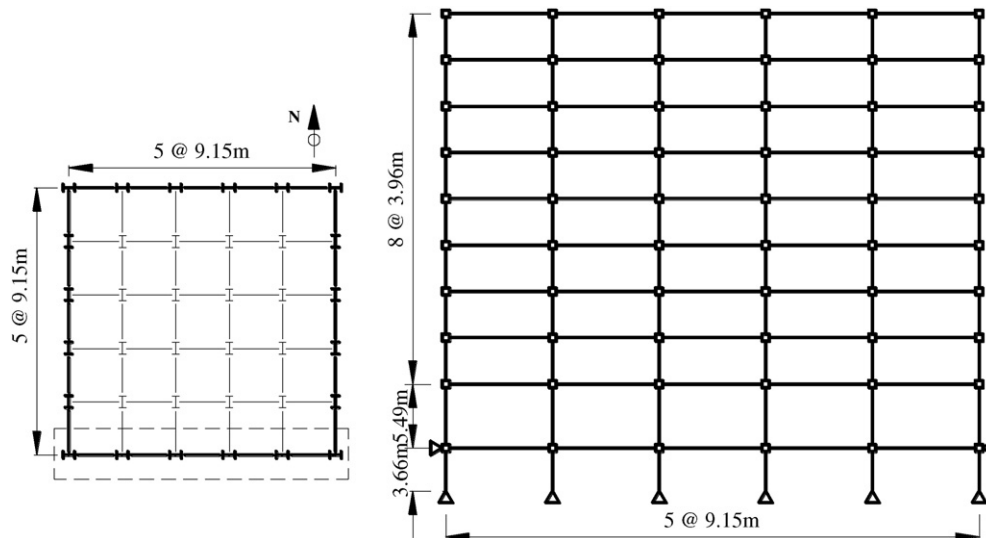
Plan and elevation of nine-story steel special moment resisting frame.
